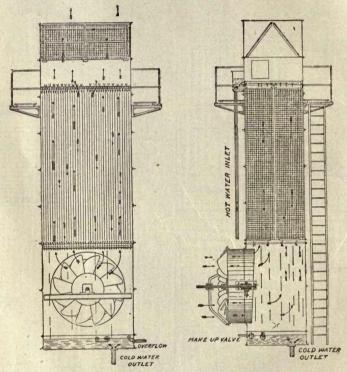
Sectional Views of Barnard Wheeler Cooling Tower.
